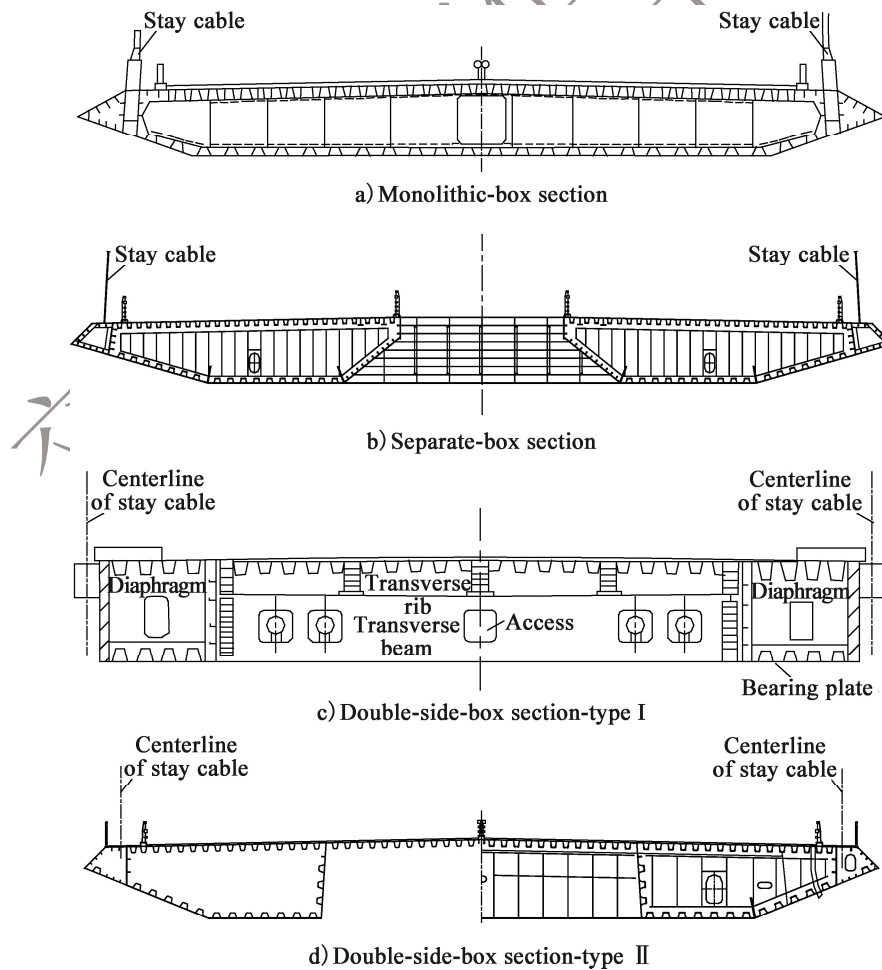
Typical cross-sections of steel box girders of cable-stayed bridges
